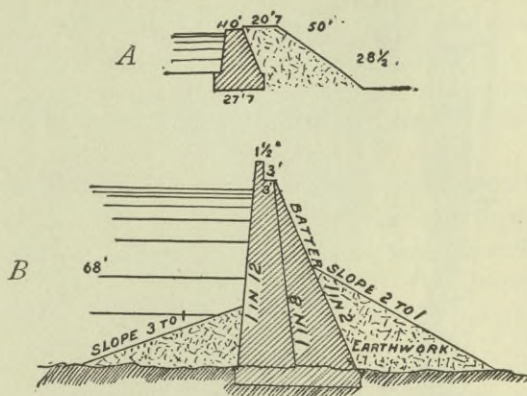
CROSS-SECTIONS OF KABRA DAM (A) AND EKRUK DAM (B), INDIA.
